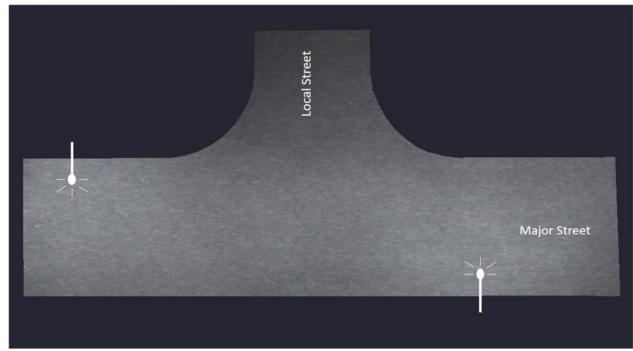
Rendering of T-Intersection: Local Street vs Major Street – Top View
